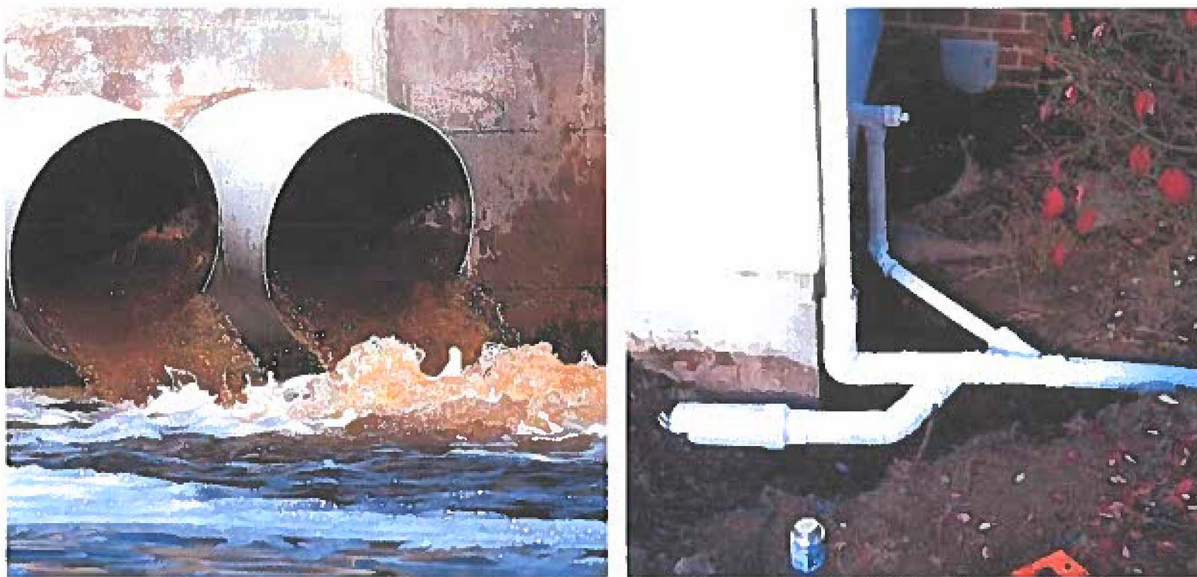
Combined Sewer Overflow & On-Site Private Sewer System
